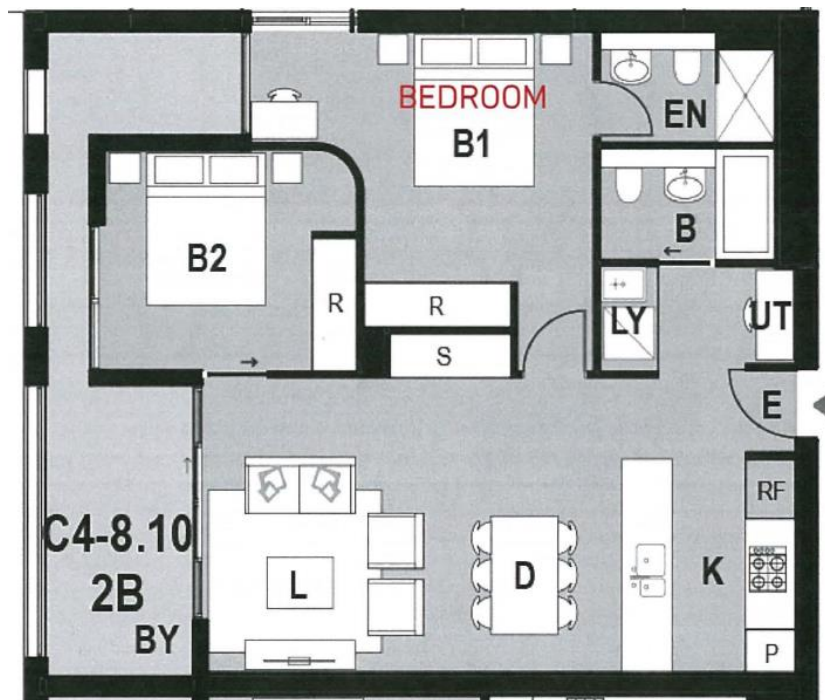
Typical floorplan demonstrating the 'snorkel' apartment.
